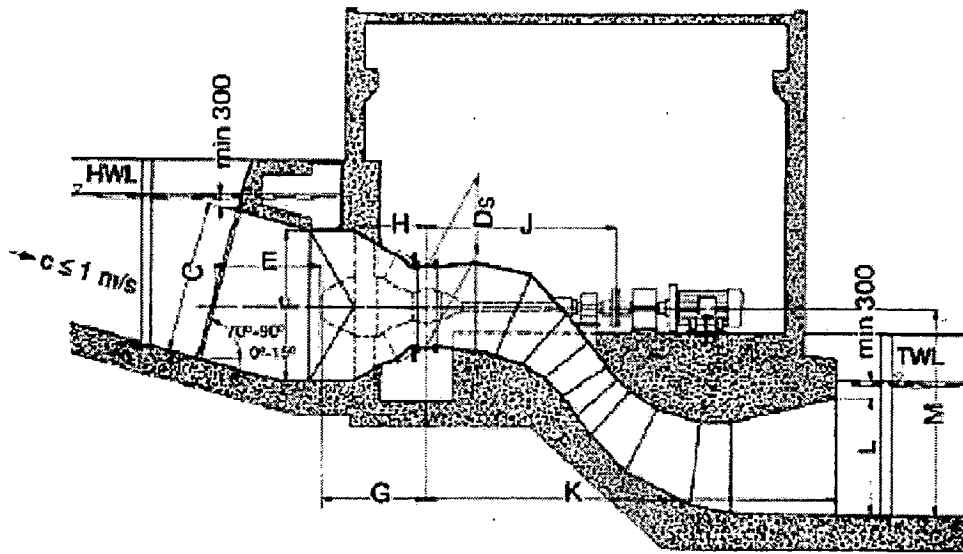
Horizontal axis “S” propeller turbine in low head setting geared generator [10]
